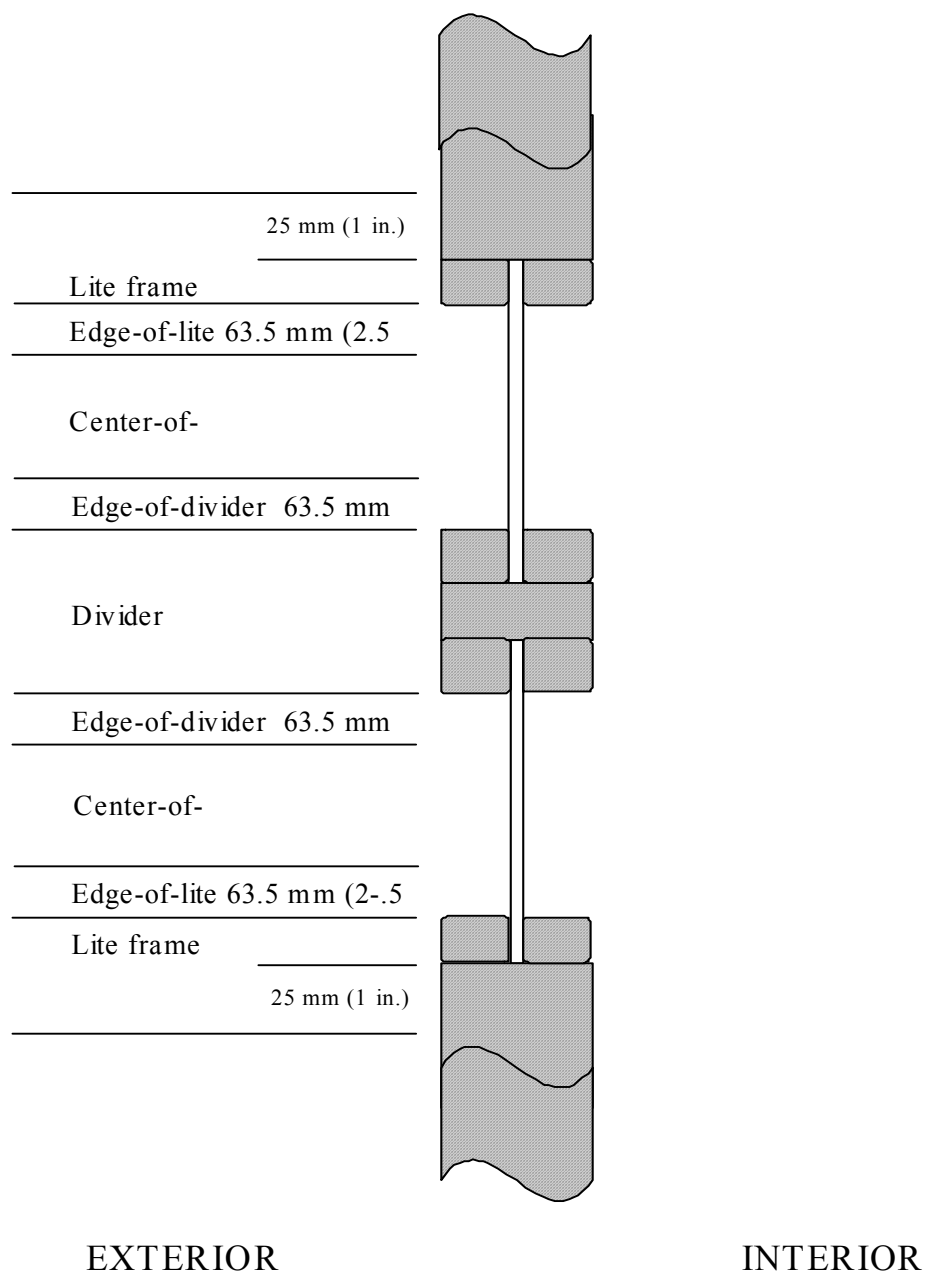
Exterior Wood Door System Area Schematic — Vertical Elevation
